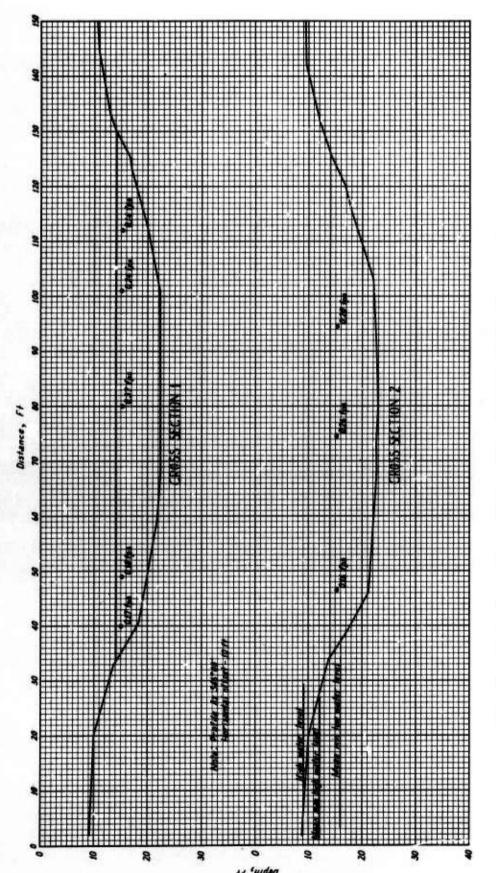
Typical cross sections, Site 1-H-10, Makhon Sawan study area
